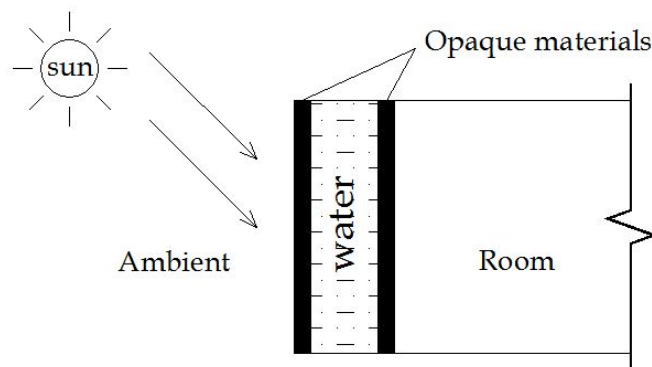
Sketch of a water wall with an opaque building envelope.
